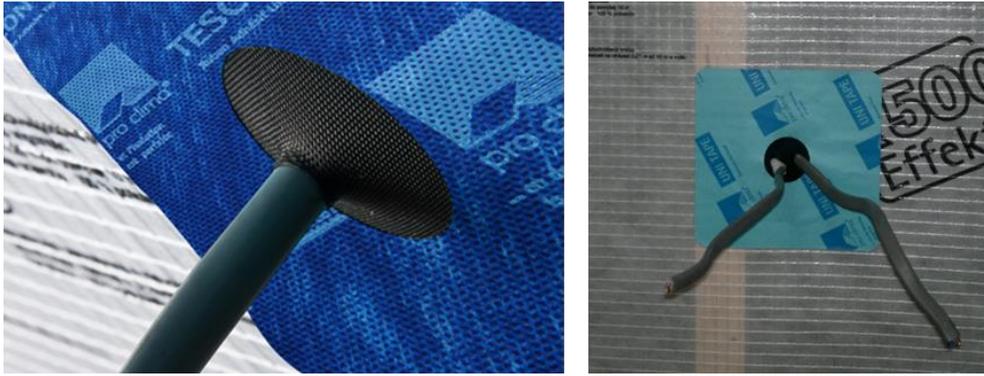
Air tightness grommet detailing for pipes and electrical services
